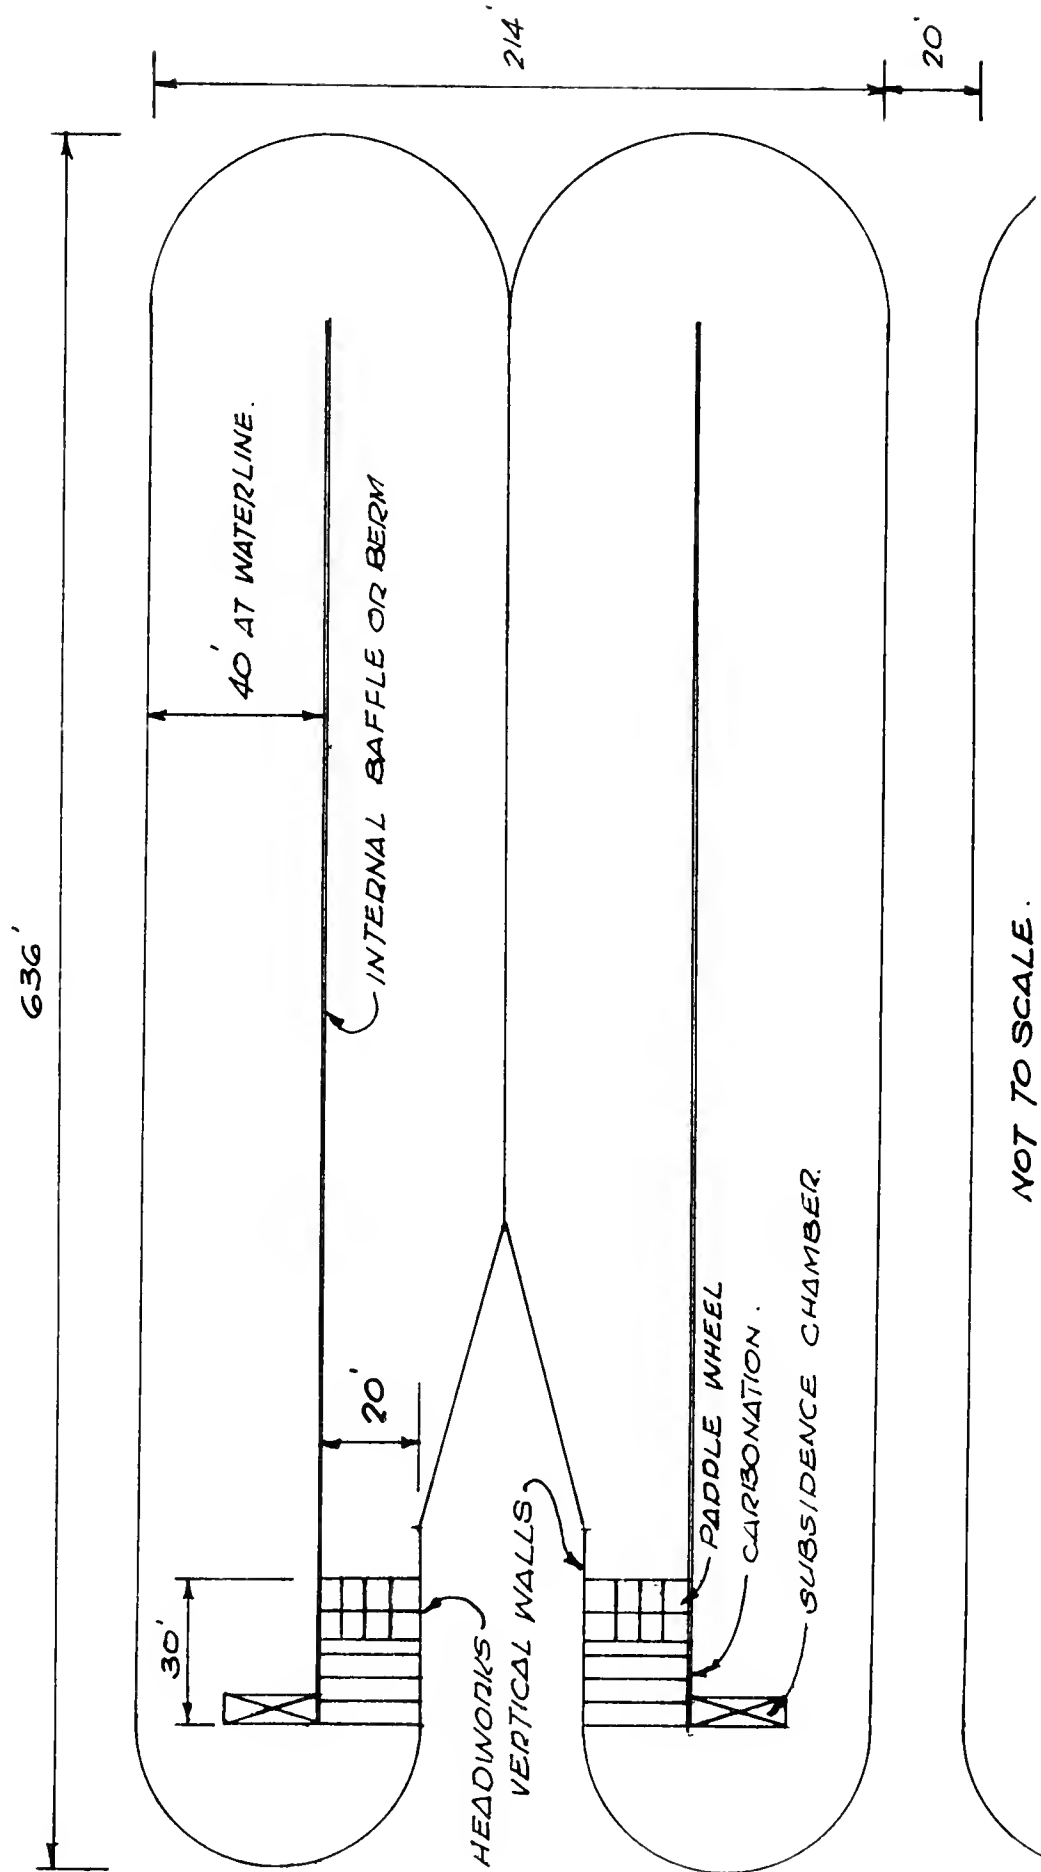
PLAN OF ONE OF TWO PAIRS OF
